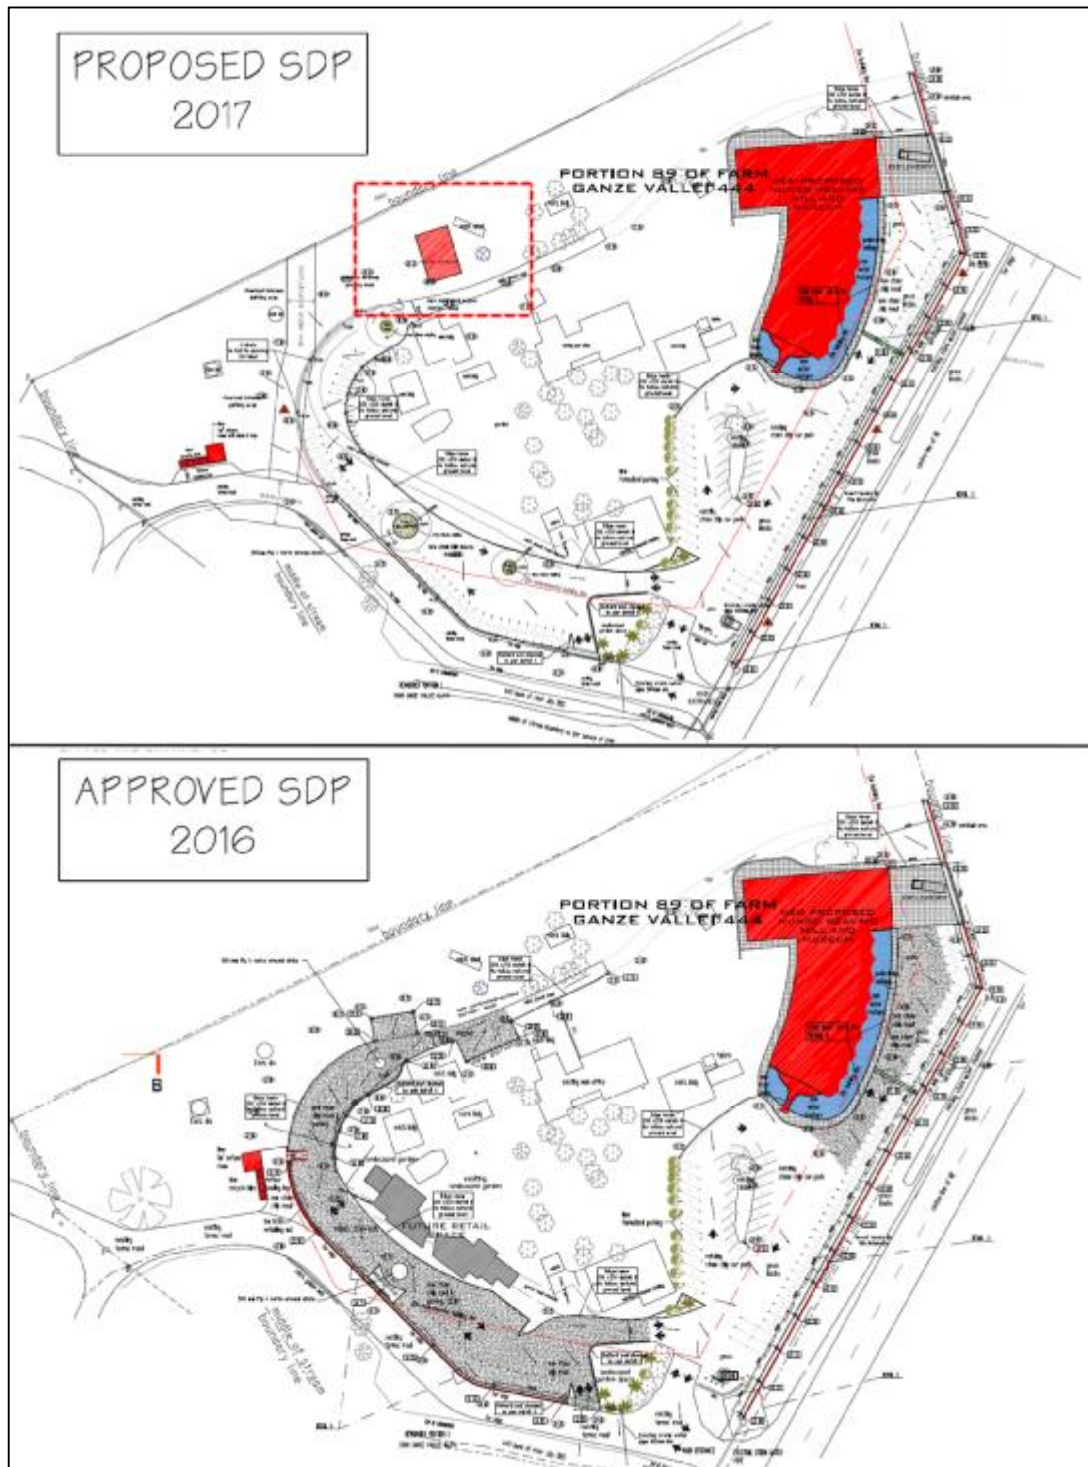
APPROVED LAYOUT VS PROPOSED LAYOUT ON OLD NICK VILLAGE
